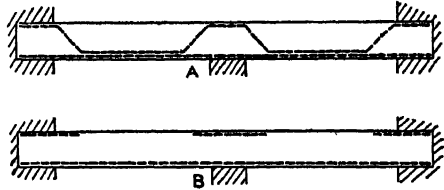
Tensile Reinforcement in Multispan Beams.
